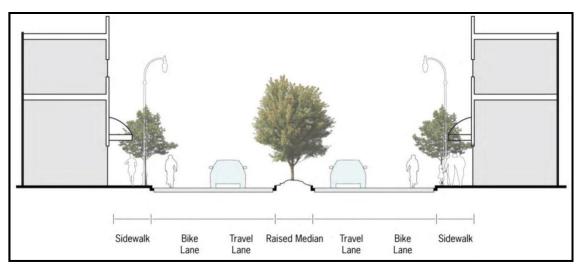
; Collective two-way road 'another cross section'. (DC & E 2012)
